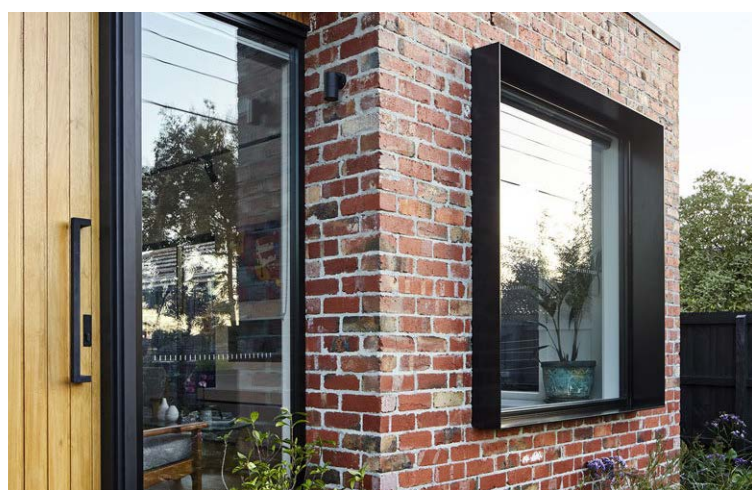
Image example of window detailing in a contemporary architectural style.
